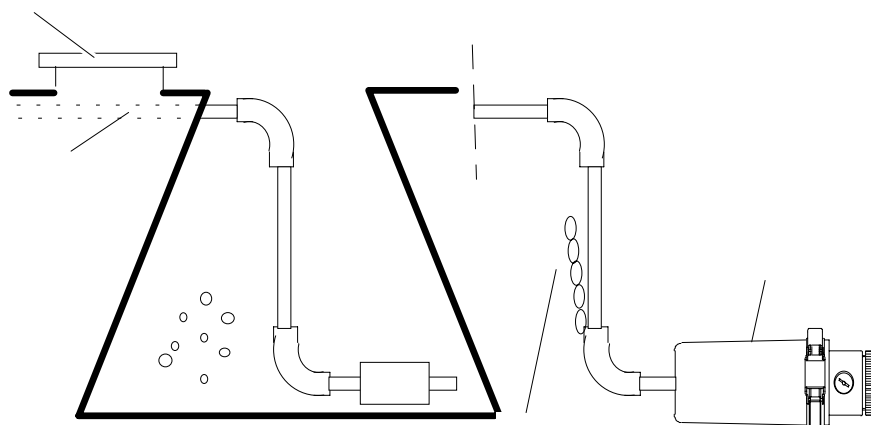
TYPICAL PERMANENT INSTALLATION OF RECHARGEABLE SENSOR WITH SUBMERSION ASSEMBLY DURING PLANT CONSTRUCTION
